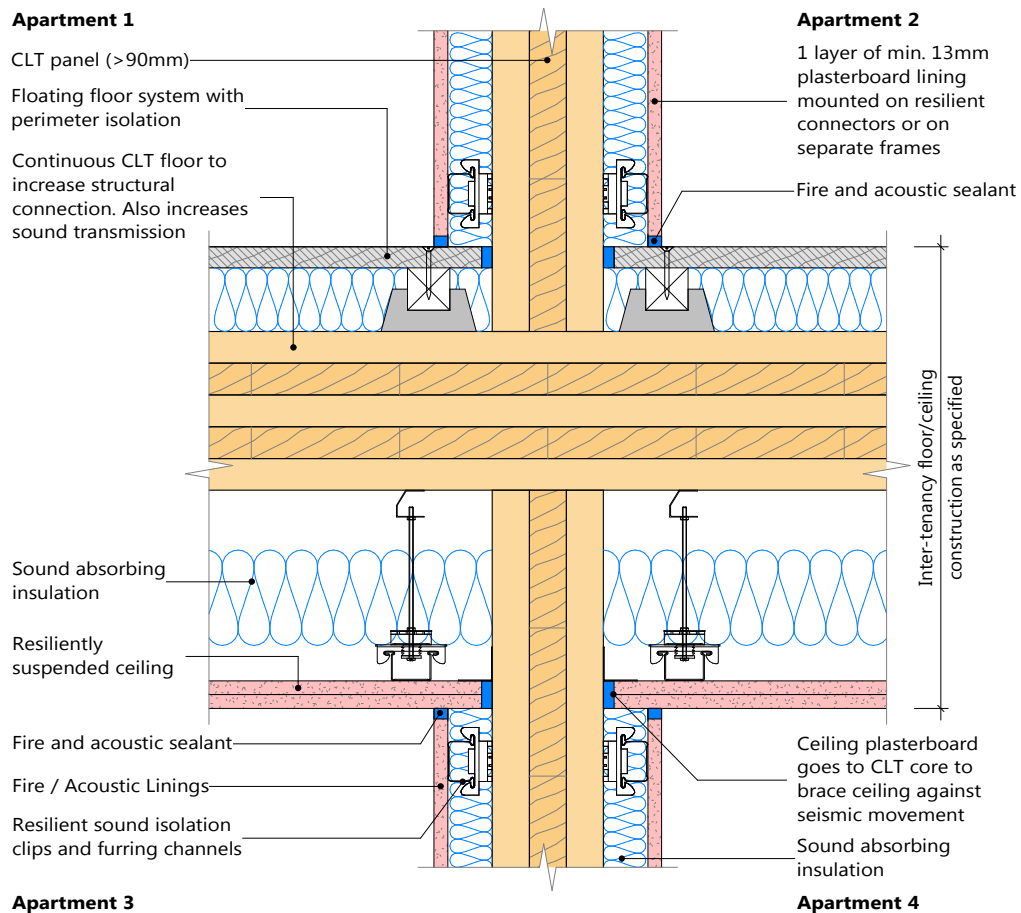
Floor junction detail with continuous CLT floor and discontinuous walls.
